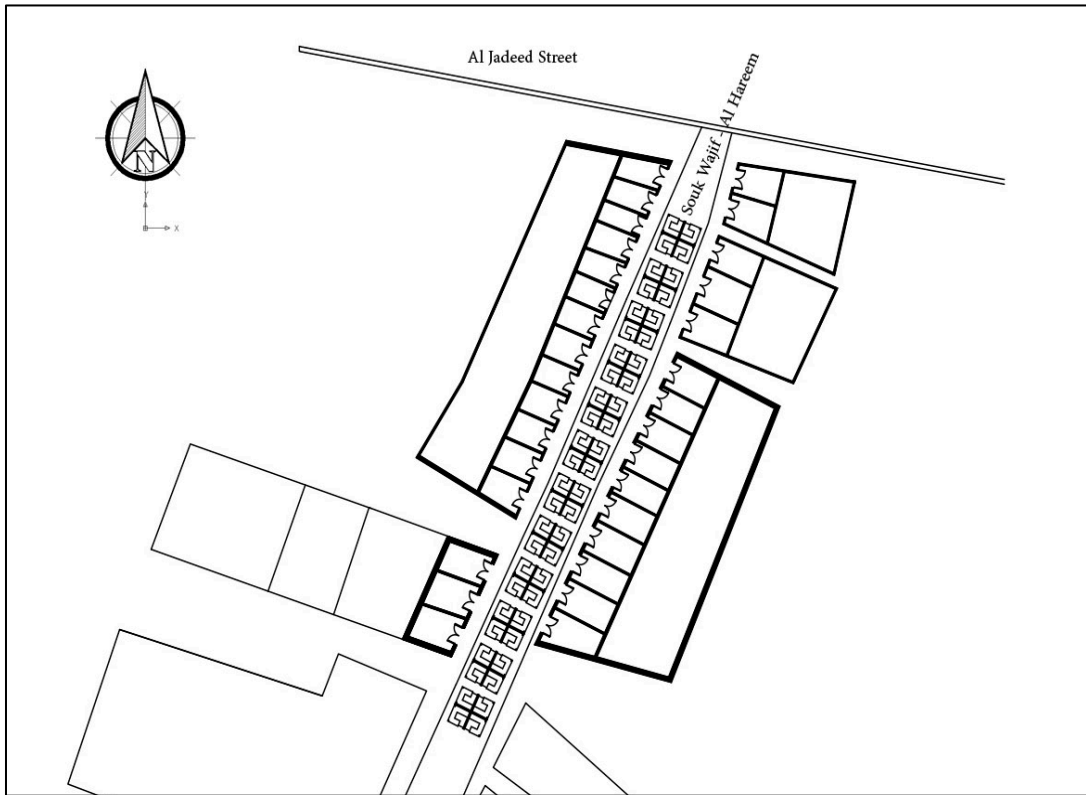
(top) Floor plan of the new design of women stalls in Souk Wajif. (Dashti, 2014).
